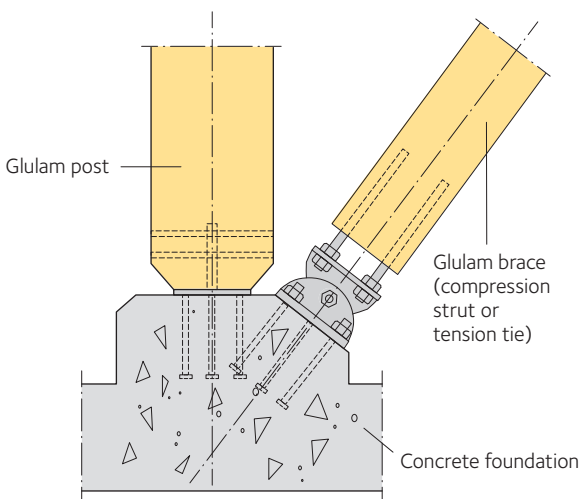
Example of connecting a rigid glulam strut with adjustable fittings to a concrete foundation
